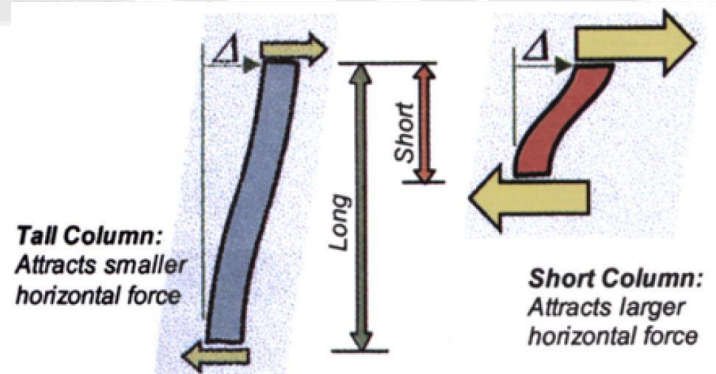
Behaviour of short columns and tall columns of same cross section
